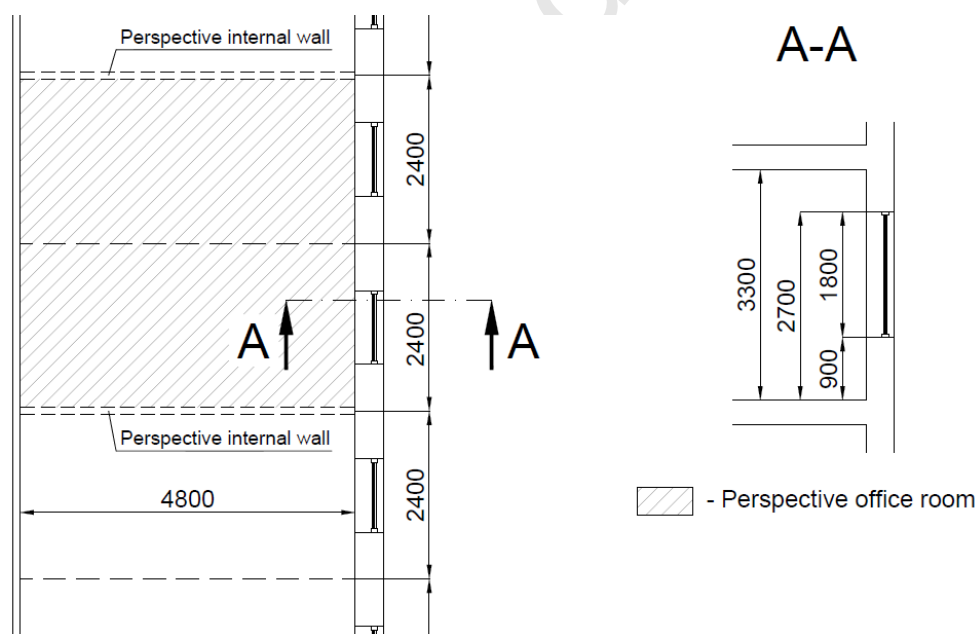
Floor plan of the open plan office module (2.4 m) and the section showing window and room height.
